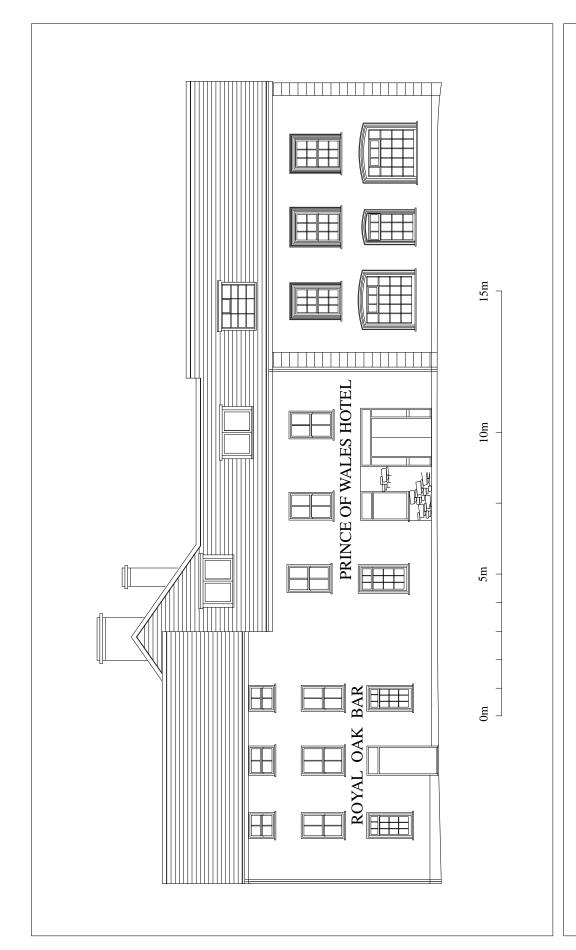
Prince of Wales, Caernarfon Existing Front Elevation. Produced by and © Pritchard Bond Architects, Bangor
